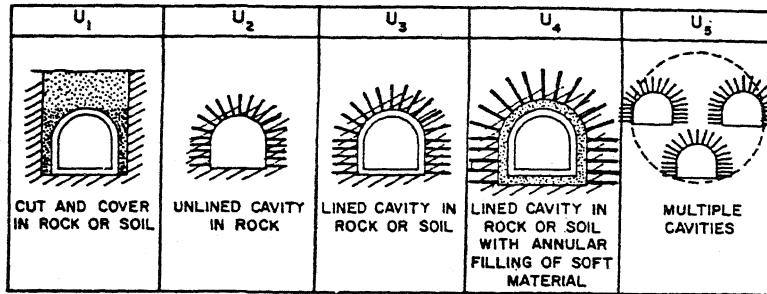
UNDERGROUND CAVITIES (SHOWING ROCK BOLTING)
